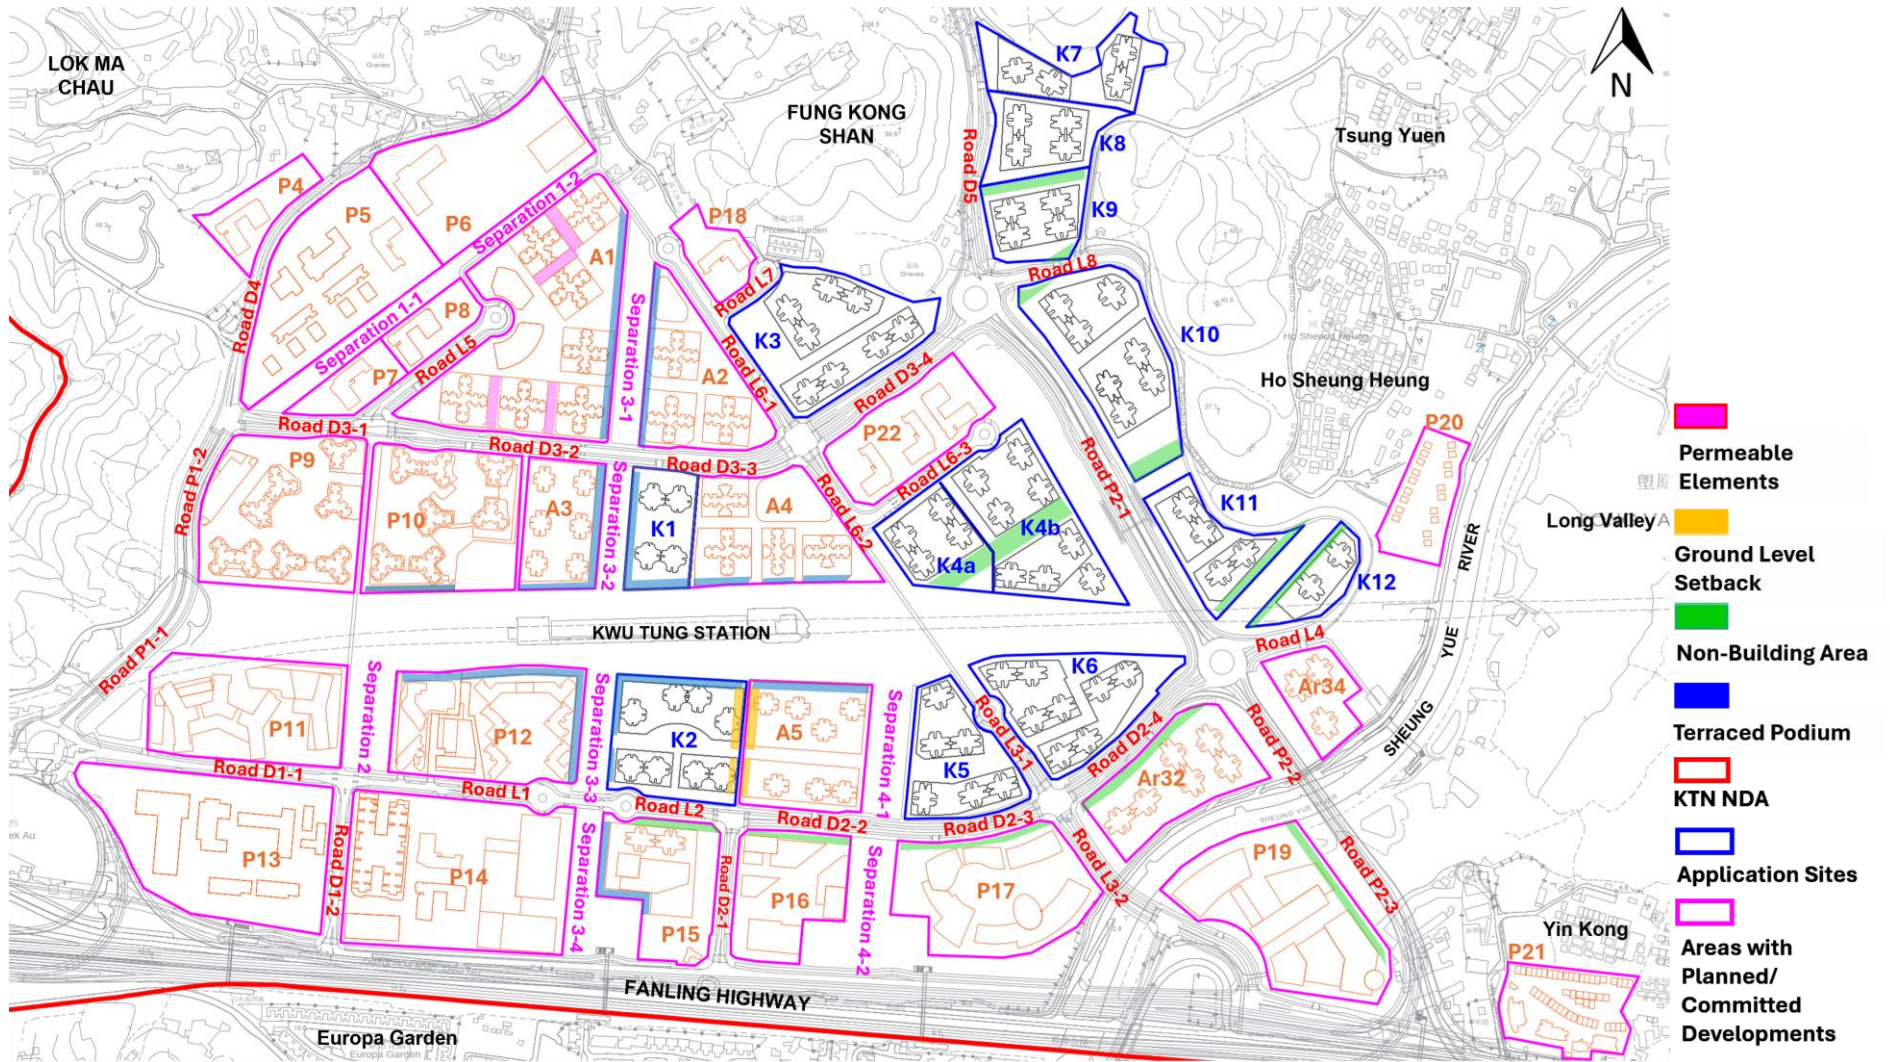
Locations of Non-Building Areas, Terraced Podiums, Ground Level Setback, Locations of Permeable Elements and Proposed Building Blocks within the Application Sites and Surroundings under the Proposed Scenario
